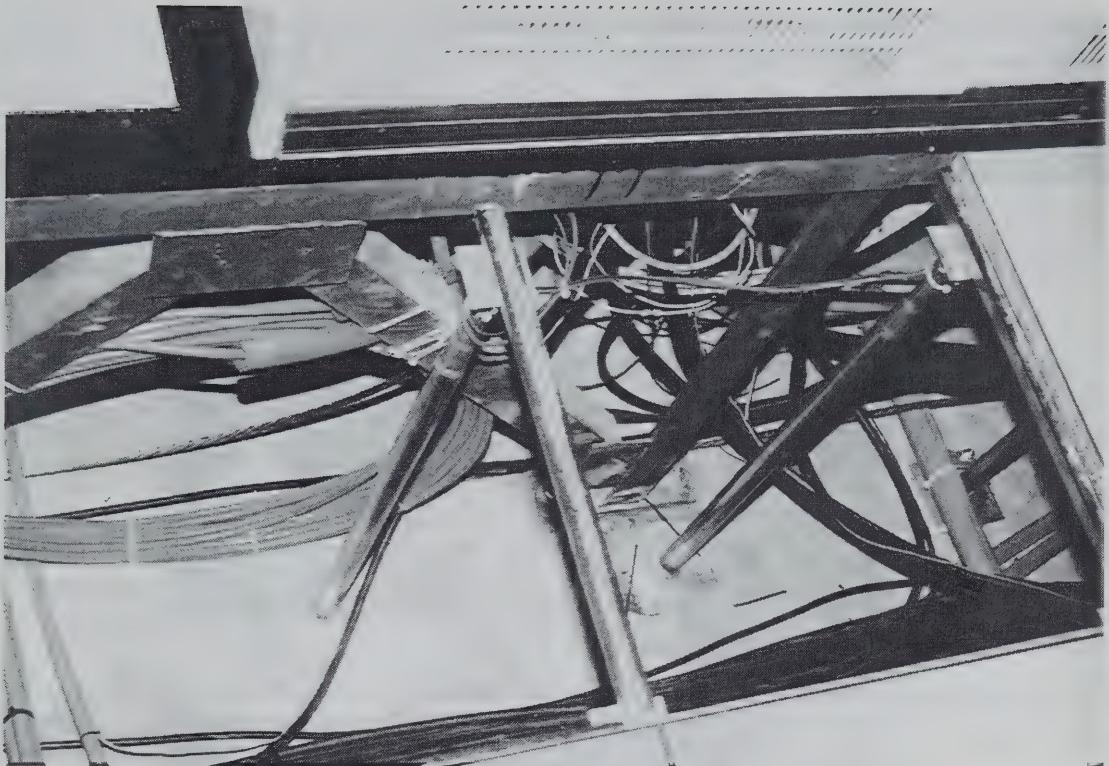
Structural frame anchored to the subfloor supports heavy equipment on raised floor.
